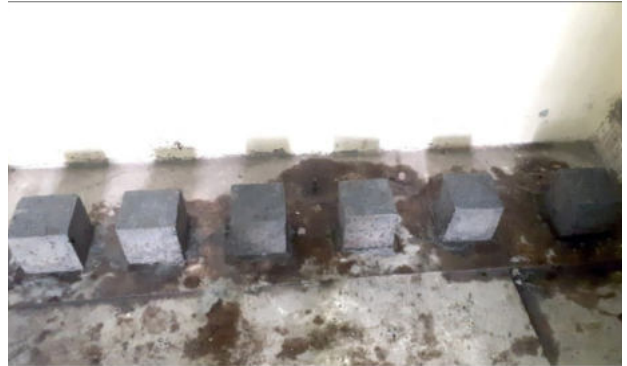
Specimen for Horizontal Shear Test Bonded on the Existing Concrete Floor, with Hydraulic Jack for Load Application
